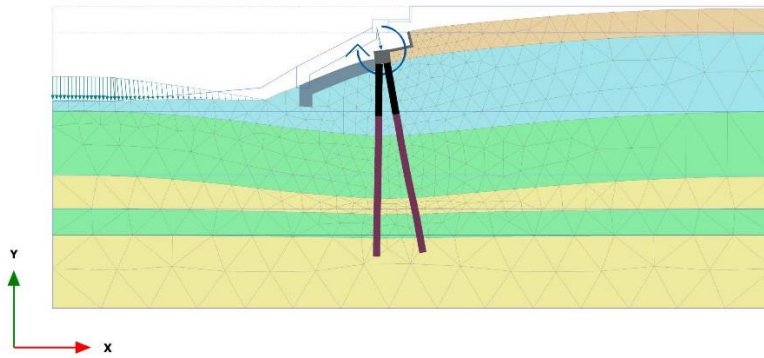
Bridge 2 deformed mesh for lower section at SLS longitudinal
